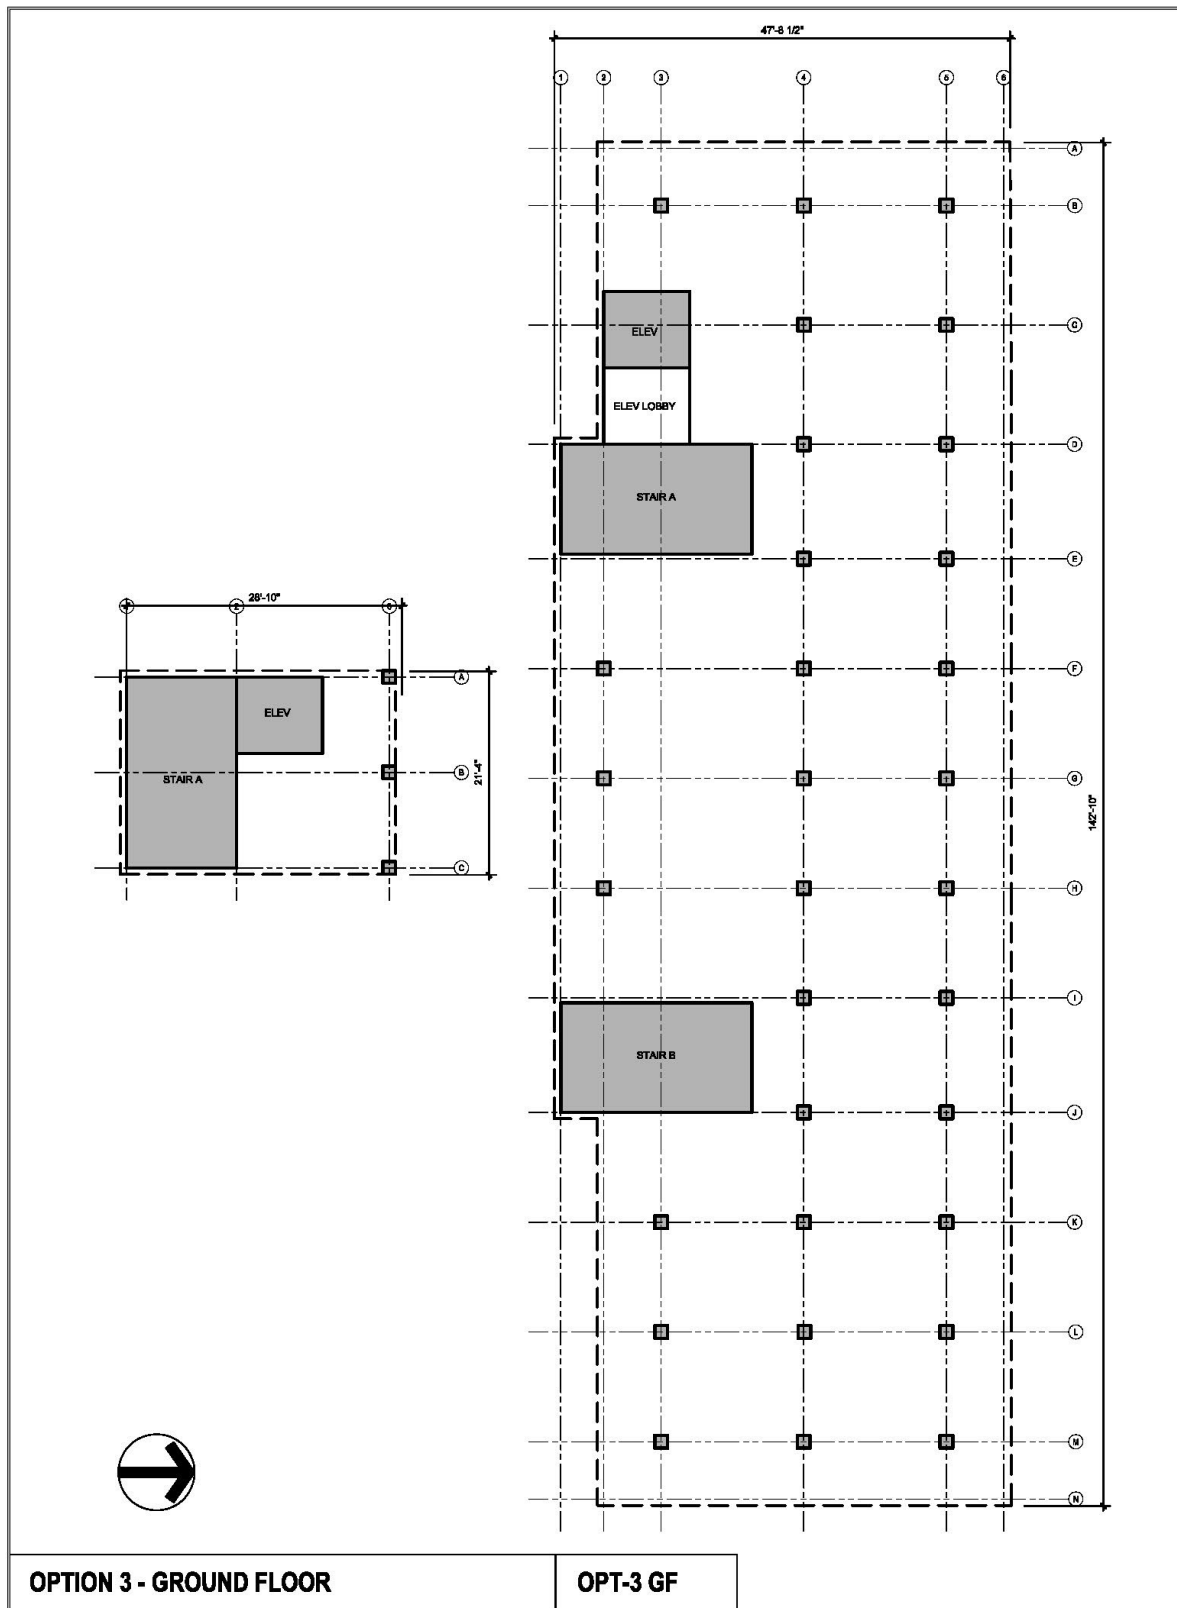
Pre-Design Building Option 3 - Ground Floor
